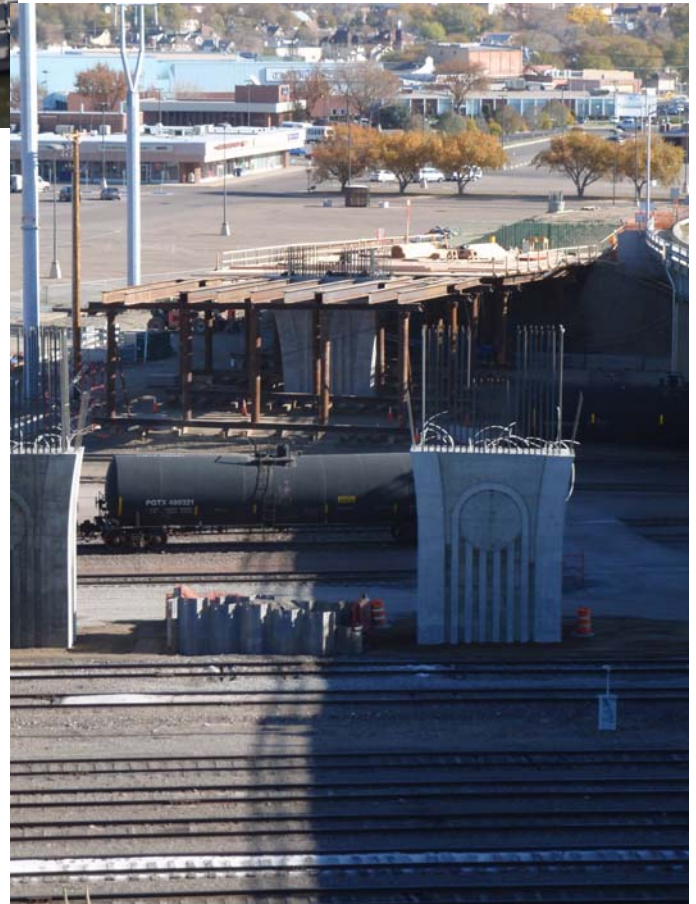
Pier 3 WB Pier Table Construction – October 28, 2008:
